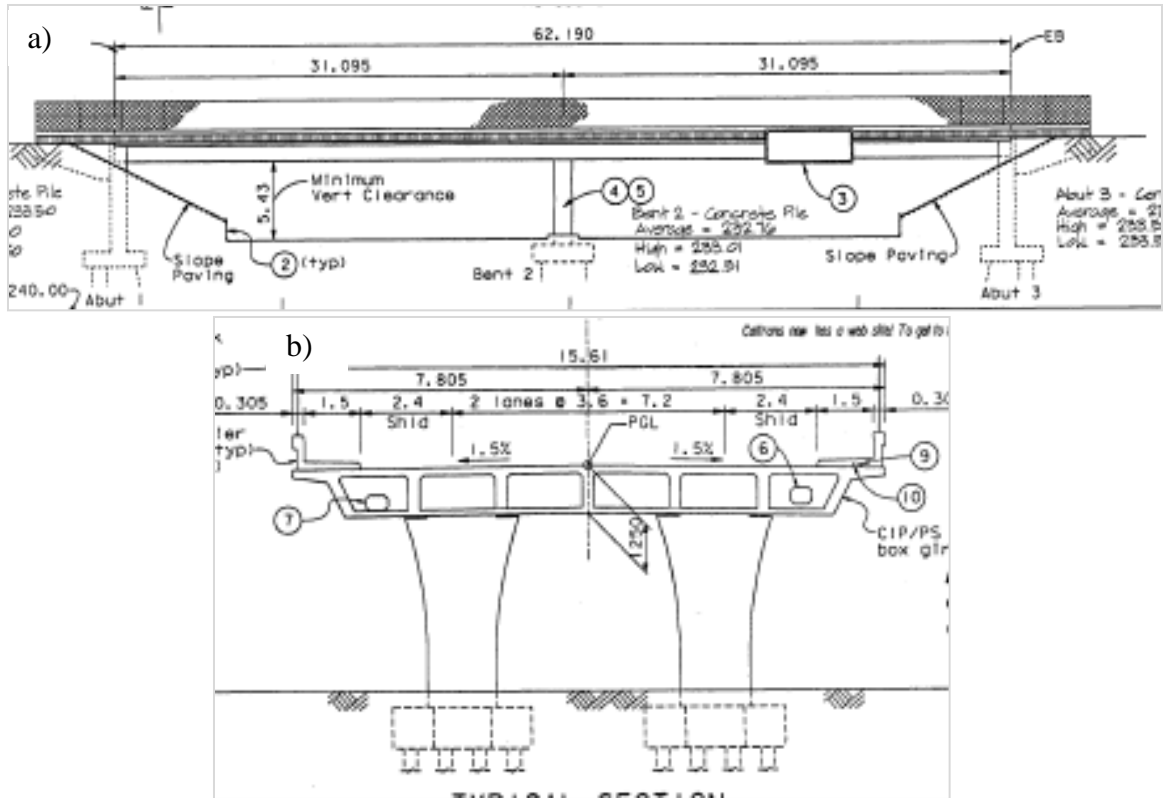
Typical configuration of two-span box girder bridge a) Elevation view, and b) Plan view.
